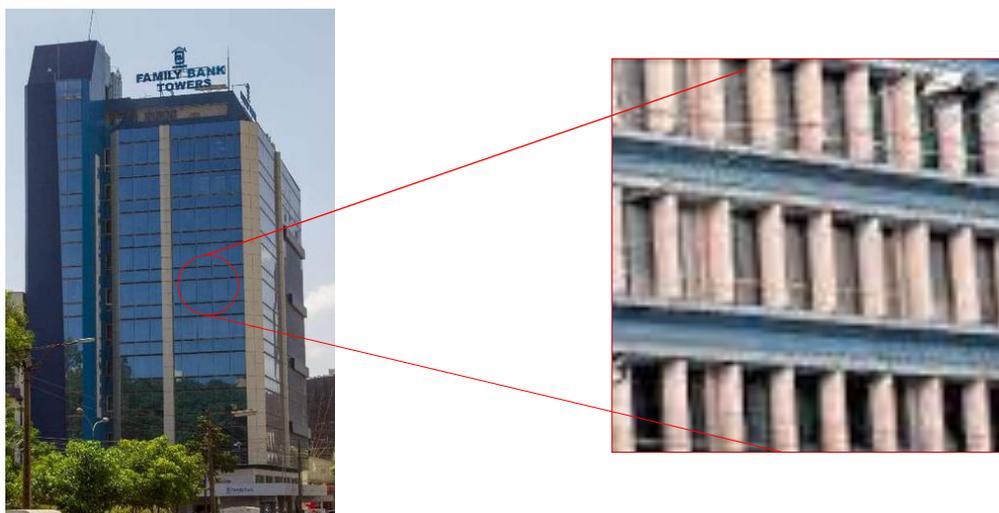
Family Bank Towers, recently fitted with glass façade (left), Source: the-star.co.ke accessed 29.05.17. 17:40, façade before glass curtain wall (right). Source: google.co.ke accessed 29.05.17. 17:39
